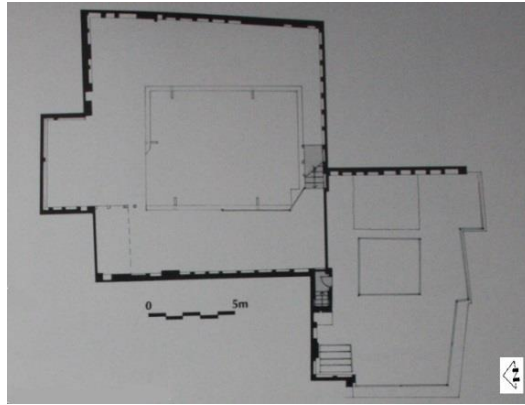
House 47 (Roof Plan) Baghdad (Warren & Fethi 1982)
